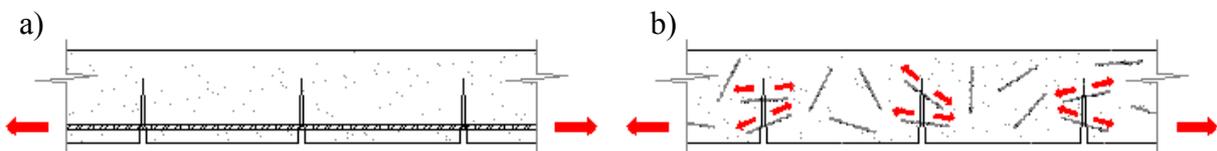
Post cracking behaviour of: a) traditionally reinforced concrete; b) SFRC
